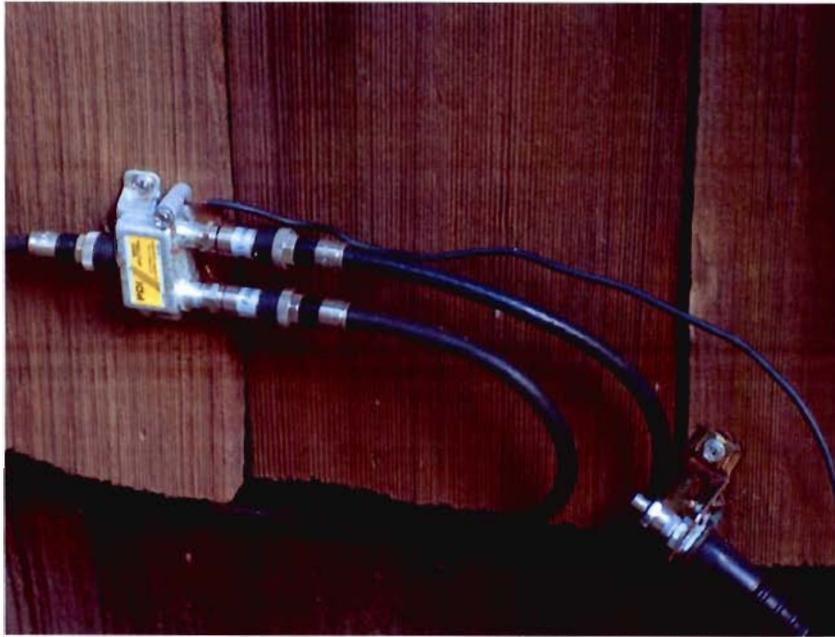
Pole # 15, [REDACTED] Laurel Hollow Road.
